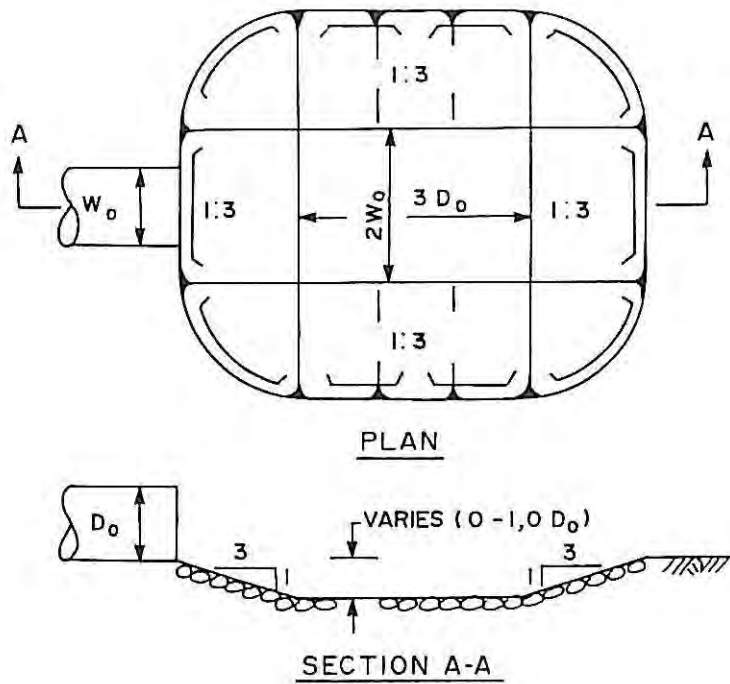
EXAMPLE OF PREFORMED SCOUR HOLE
